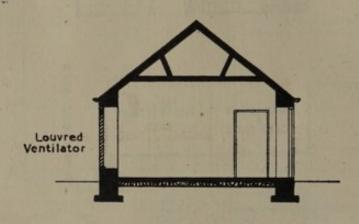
Plan O. Steading for Farm of 20 to 30 Acres
